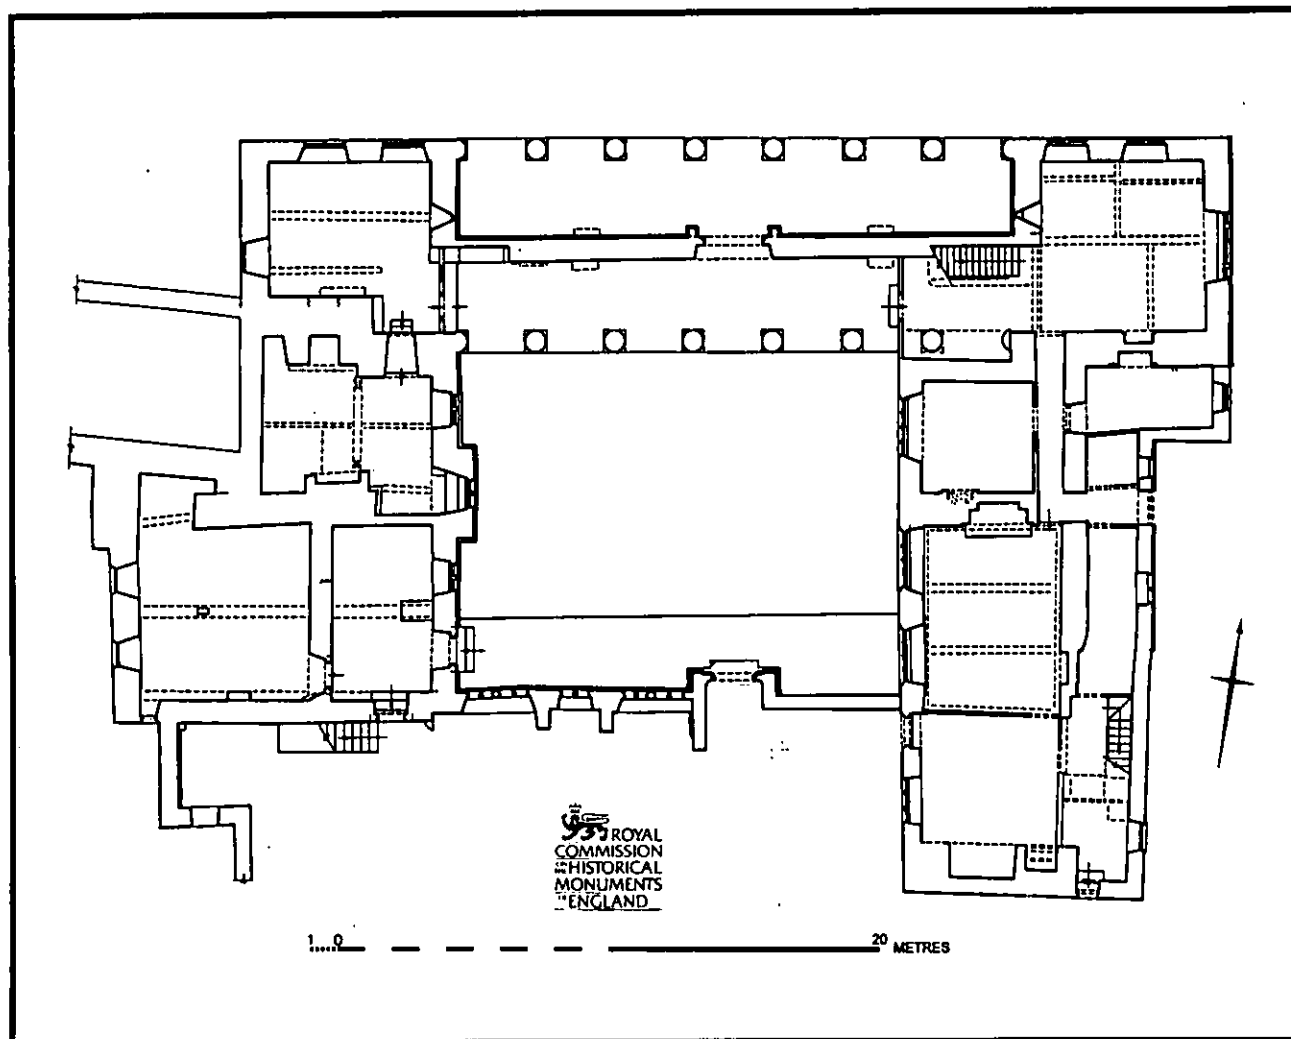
RCHME plan of Godolphin House, ground floor. Surveyed at 1:100 scale, reduced for this report.
